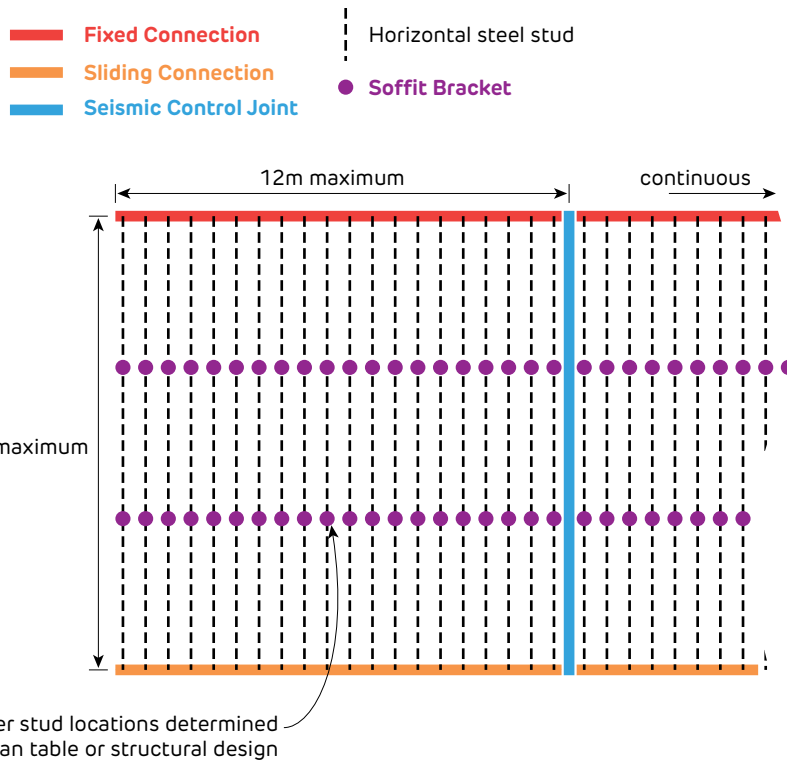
Stud Ceiling Type A4 - Fixed / Sliding
